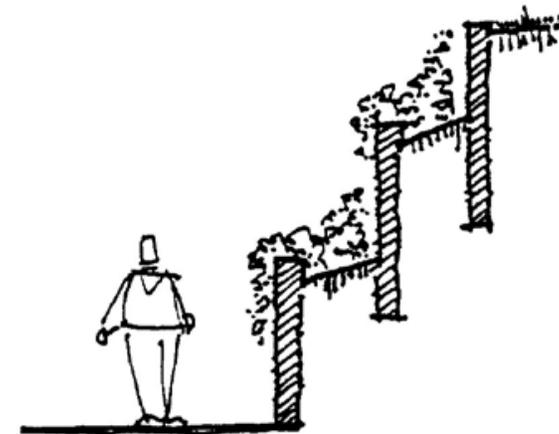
Use landscaping to screen retaining walls near pedestrian ways.
